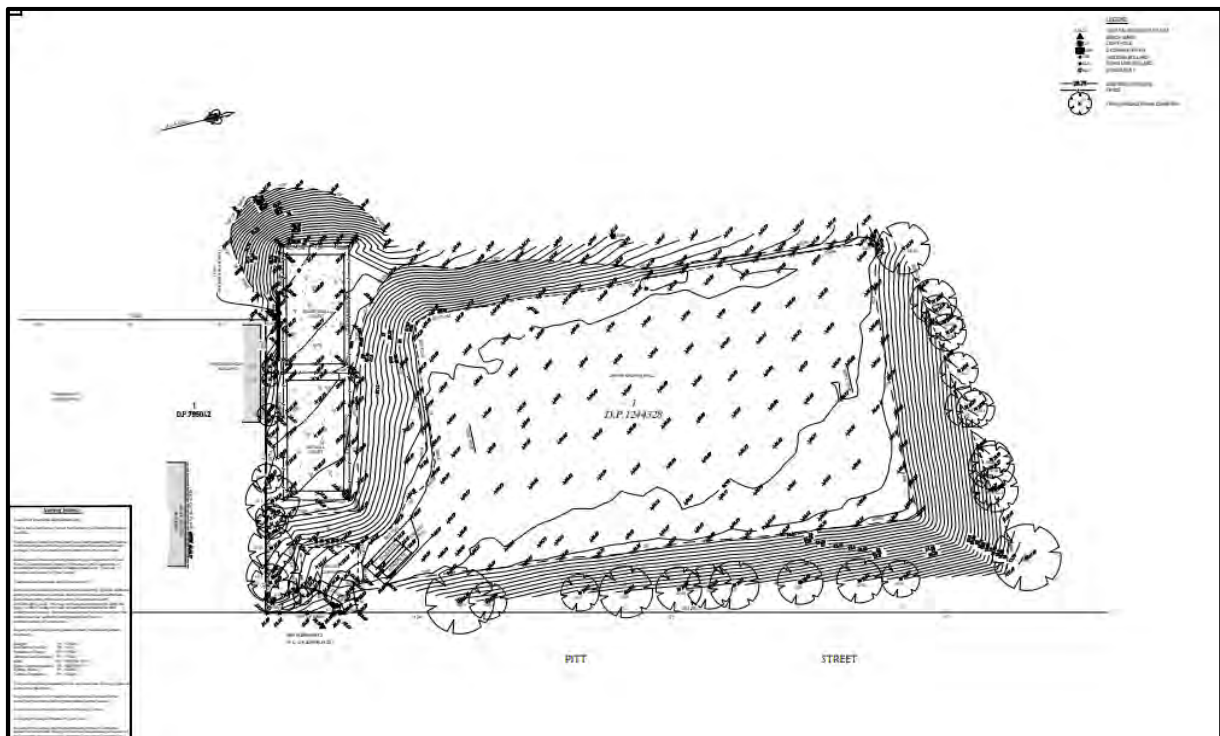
Survey Plan Overview (Source: Craig & Rhodes)
